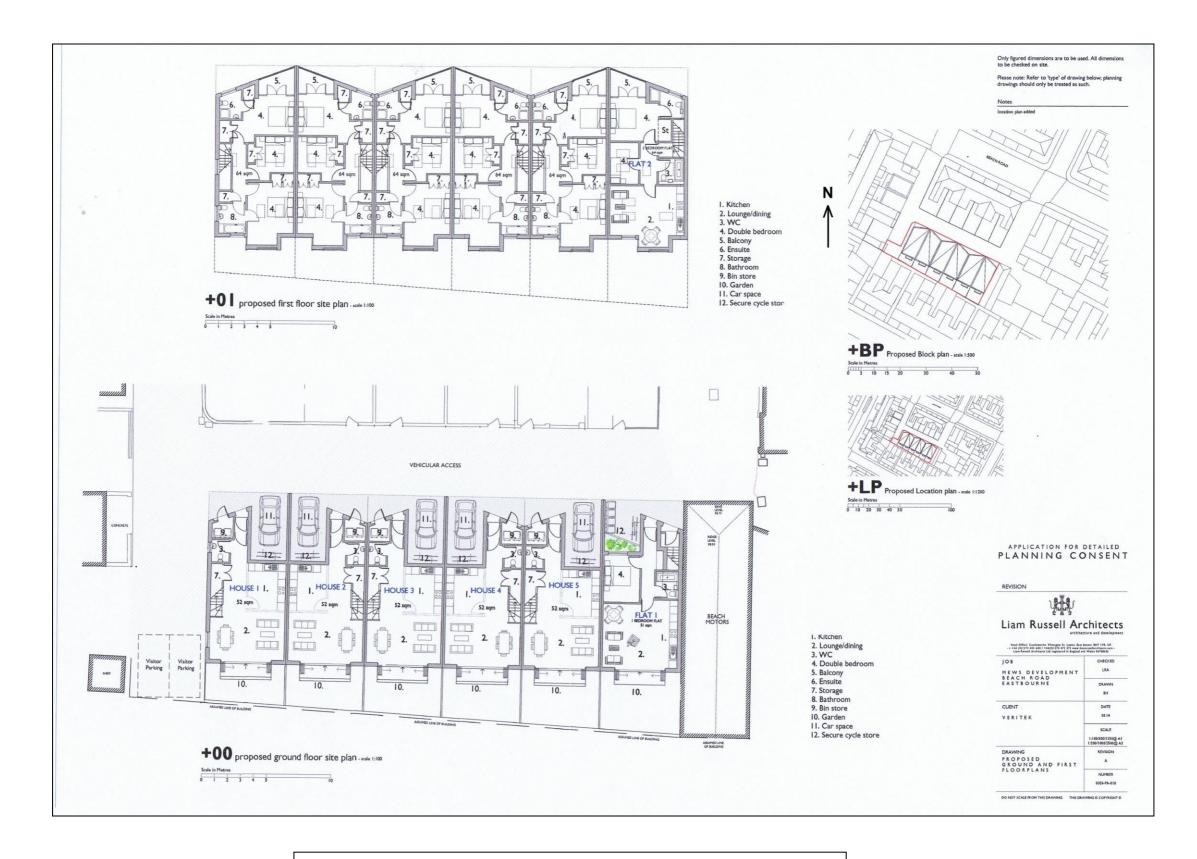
2A Beach Road, Eastbourne: Site Development Plan
